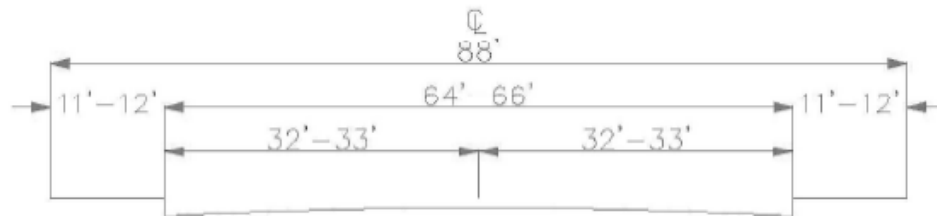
CITY OF SAN BERNARDINO GENERAL PLAN ROADWAY CROSS-SECTIONS
